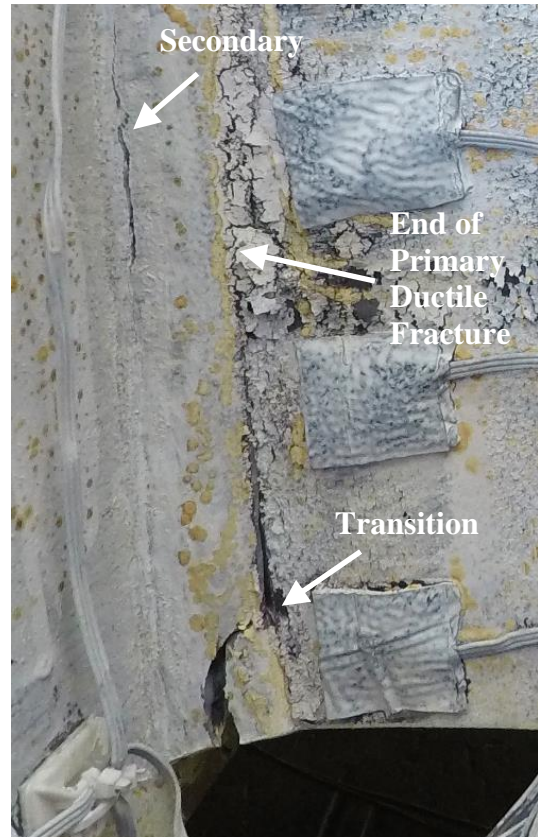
Specimen W1: East Beam Top Flange CJP Weld Fracture at -0.04 rad (2nd Cycle)
